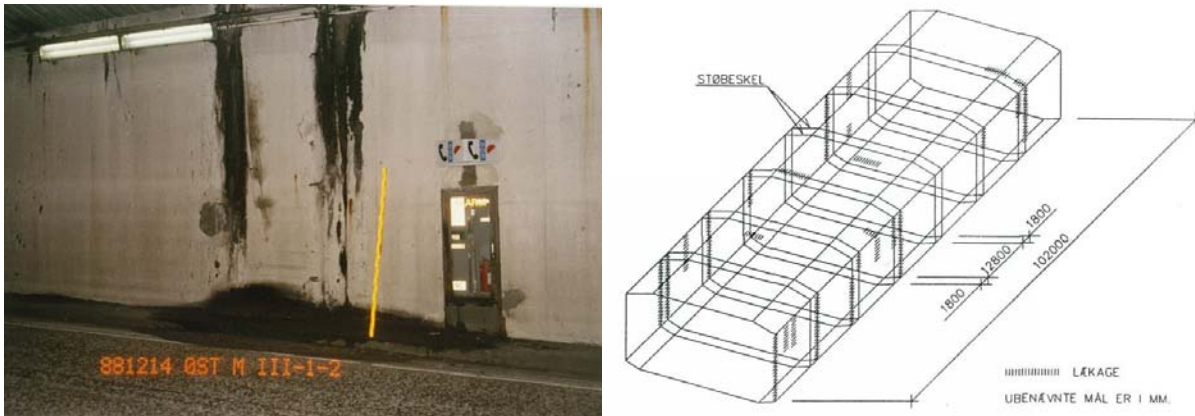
Water Leakage at the short sections (Dimensions are shown in mm)
